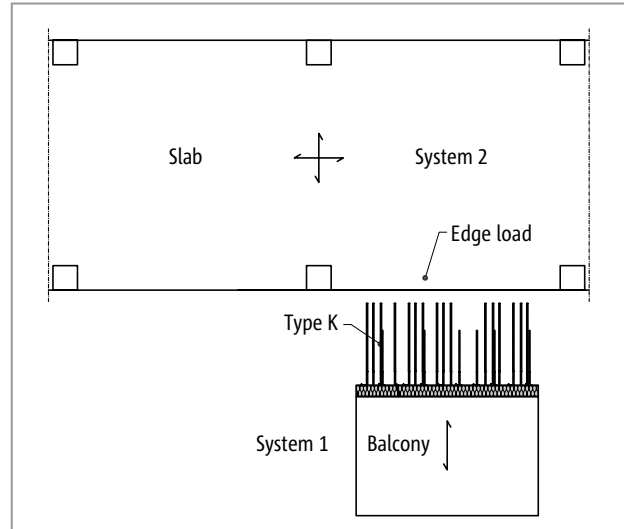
For the design of the floor and of the balcony the balcony slab is to be decoupled from the overall system (System 1 and 2)
